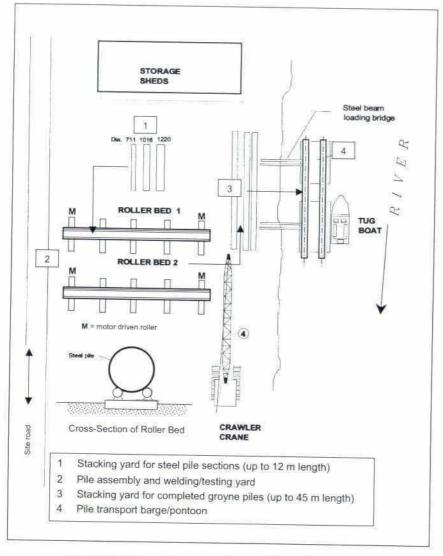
Typical layout of a pile assembly and finishing yard
